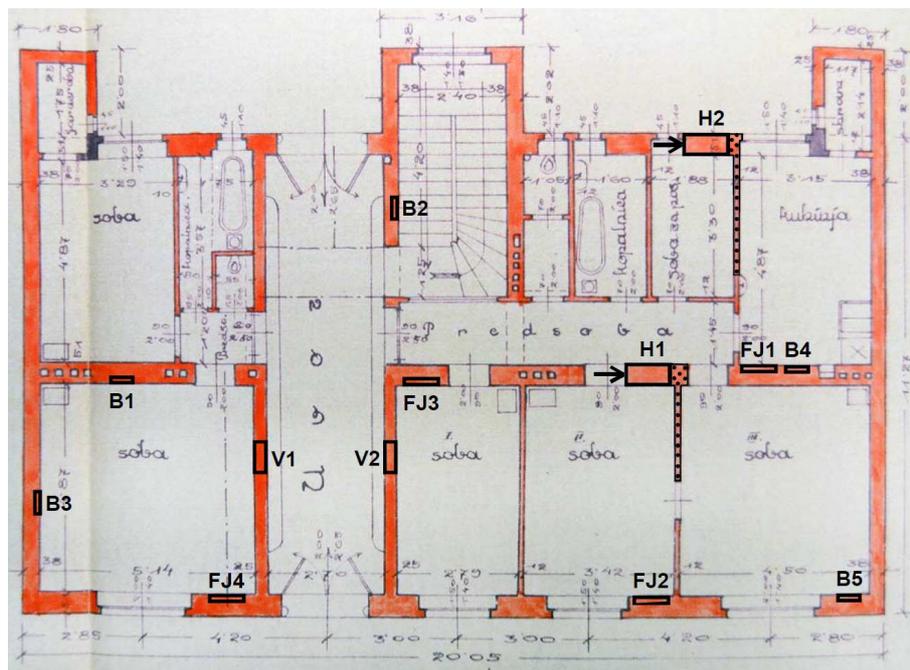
Plan of ground floor with positions of in-situ lateral resistance tests (H1 and H2), flat-jack tests (FJ1 to FJ4) and places of the extraction of brick specimens (B1 to B5) and small walls for laboratory compression tests (V1 and V2)
